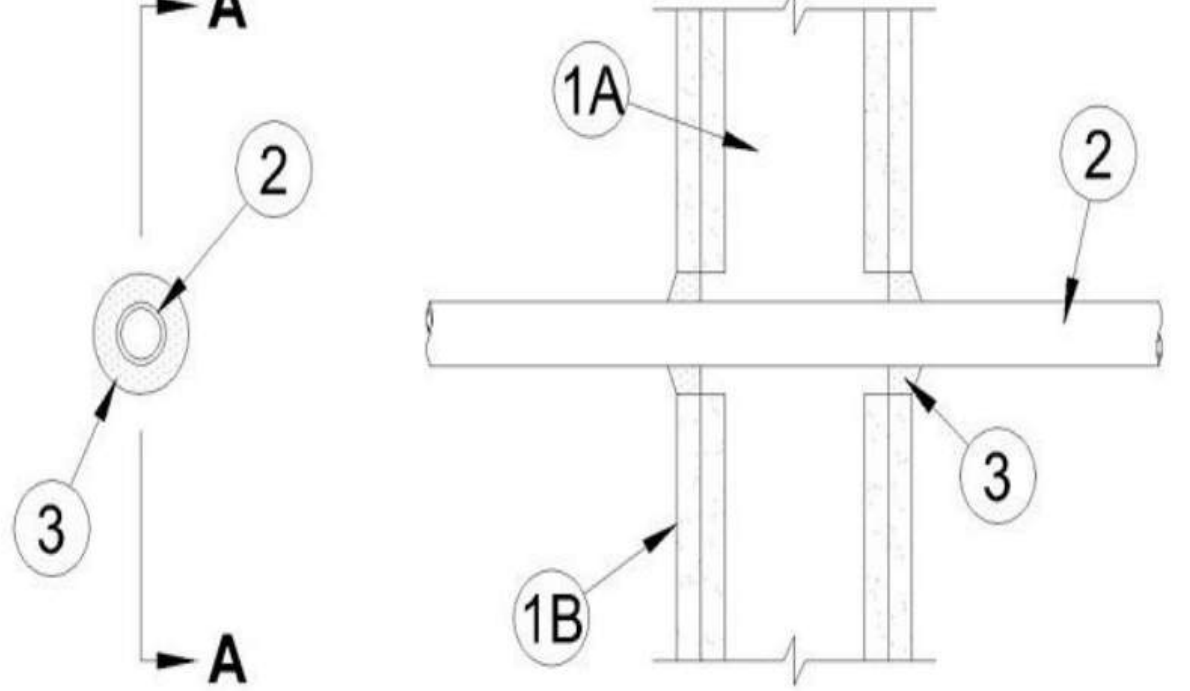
PIPE PEN. @ FLOOR/CEILING
